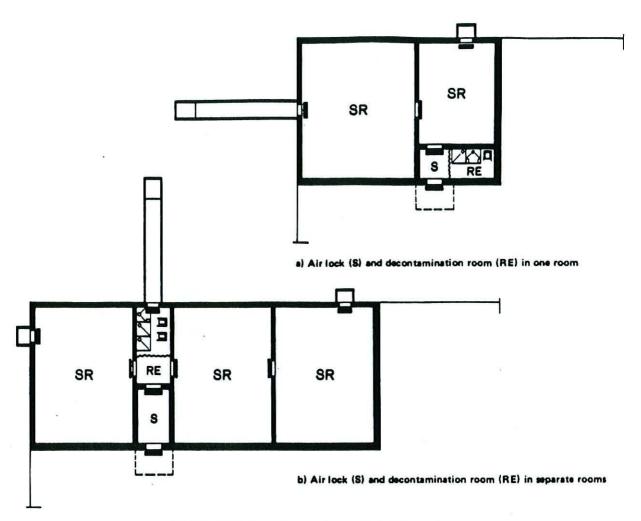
Arrangement of air locks and decontamination rooms.
